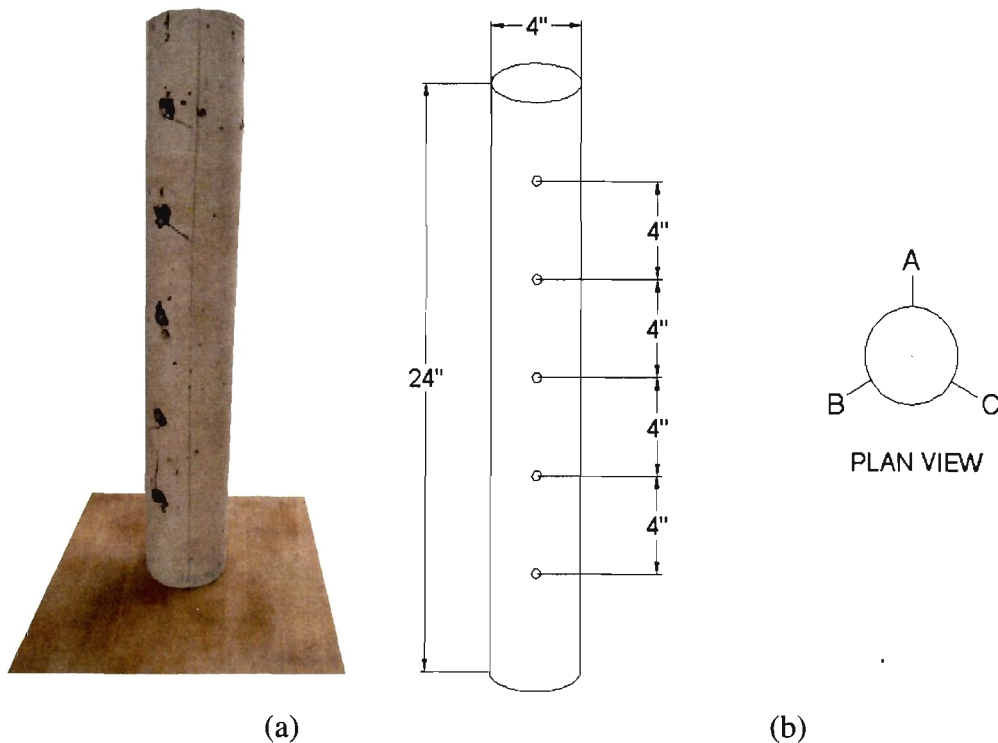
Shrinkage specimen details. (a) Concrete shrinkage specimens with DEMEC points. (b) Dimensions of shrinkage specimen and placed DEMEC points. A, B, and C are at 120° angles.
